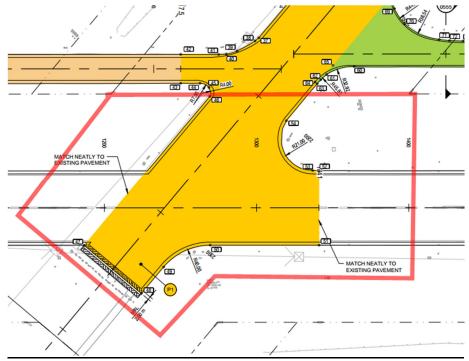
RWY Intersection Pavement Scope of Works (Red Box)
